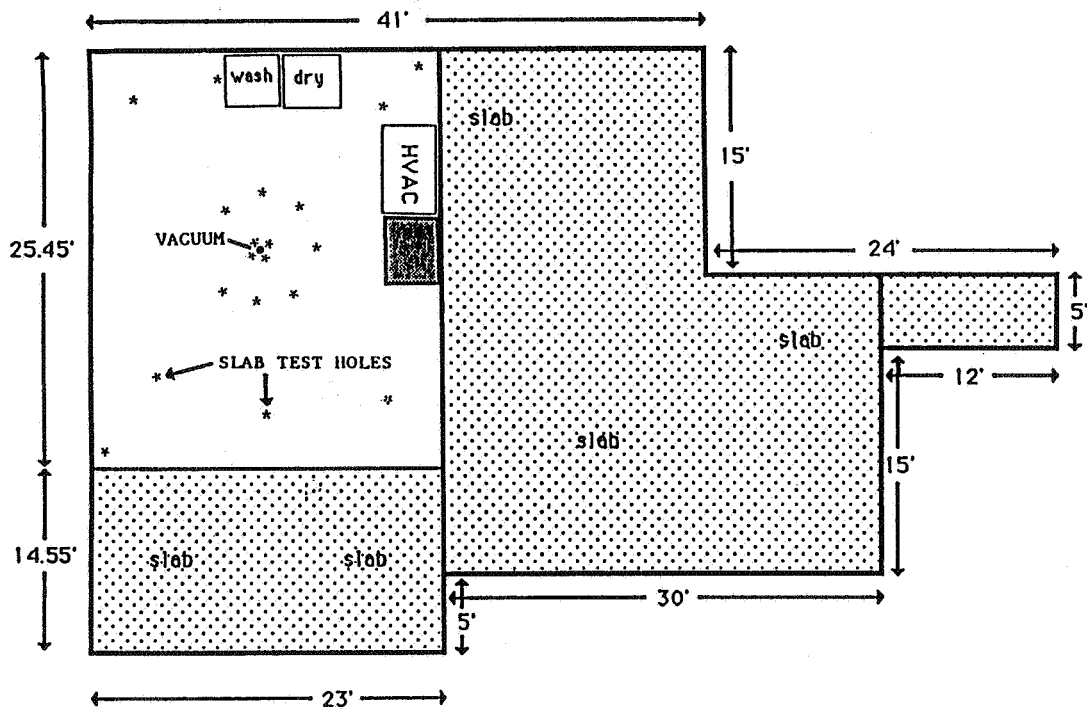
Plot plan of substructure of test house #21 pointing out basement and crawl space areas (noted slab) and details of where the suction is applied ●, and where pressure and velocity measurements are made *.
